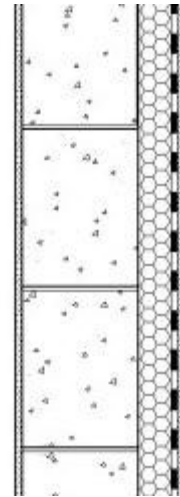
Wall towards outside air (source: ISO-PLUS-SYSTEM, 2010)
